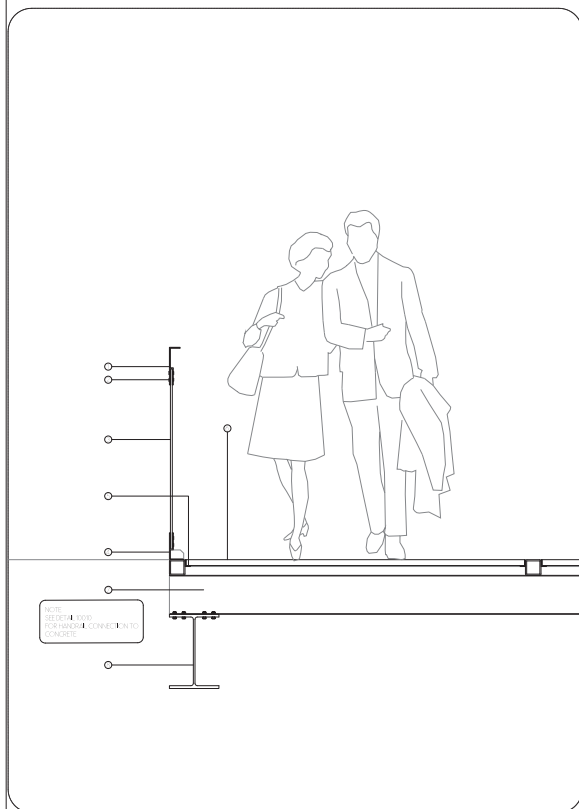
WATERPROOFED EDGE DETAIL
